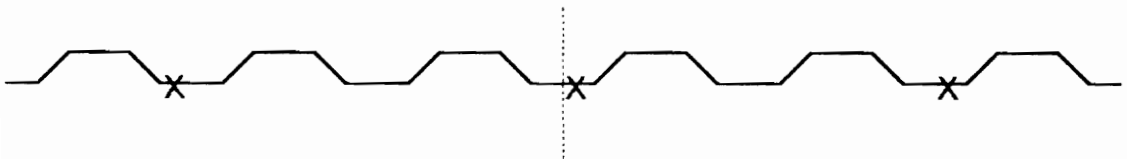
SDI-2/20-3-9 Concrete Strain Gage and Shear Stud Locations
